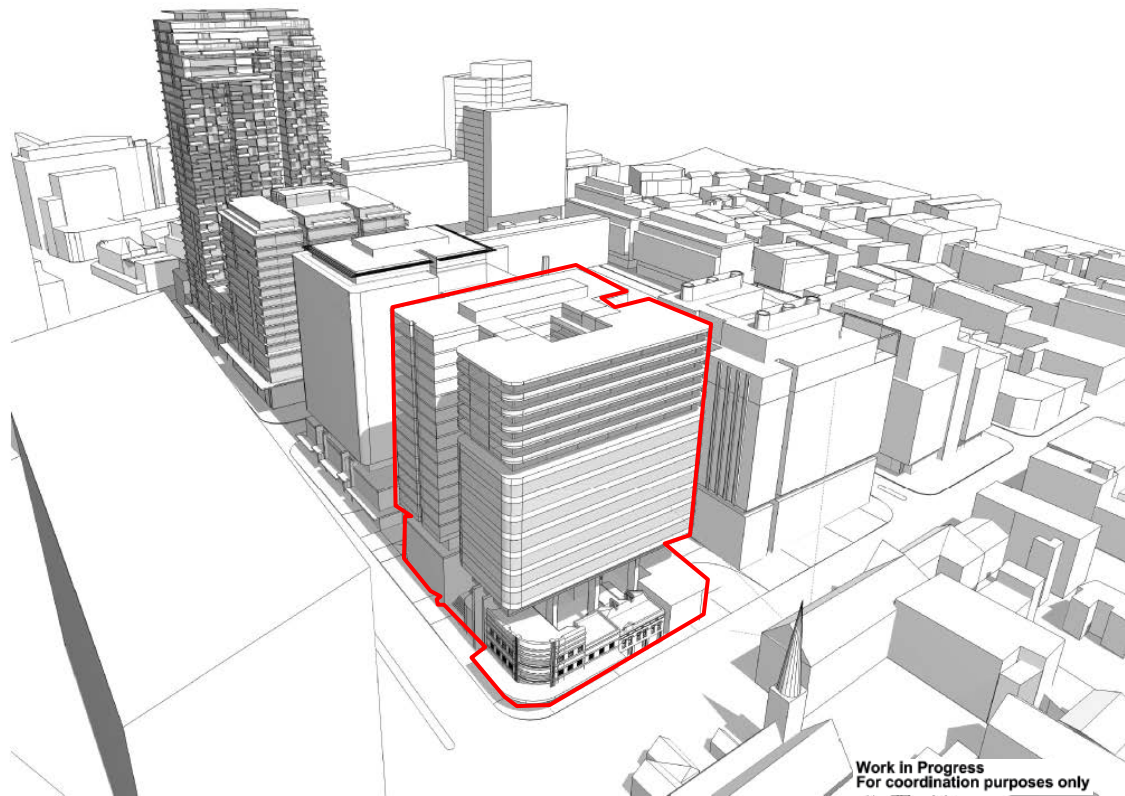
Perspective of the proposed building at Block 4N - elevated
